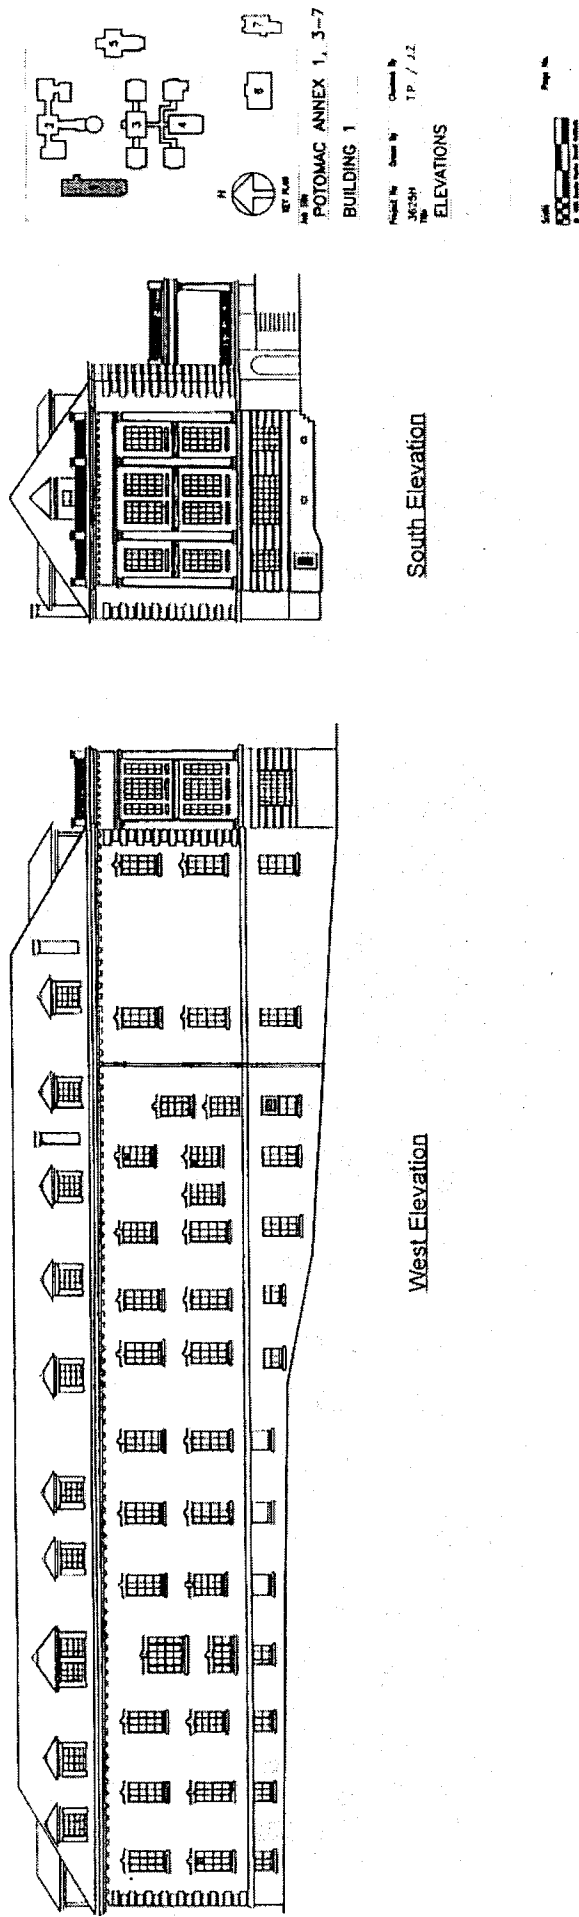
Building 1. West and South Elevations. These elevations represent the conditions of the buildings as they existed in 1994.
